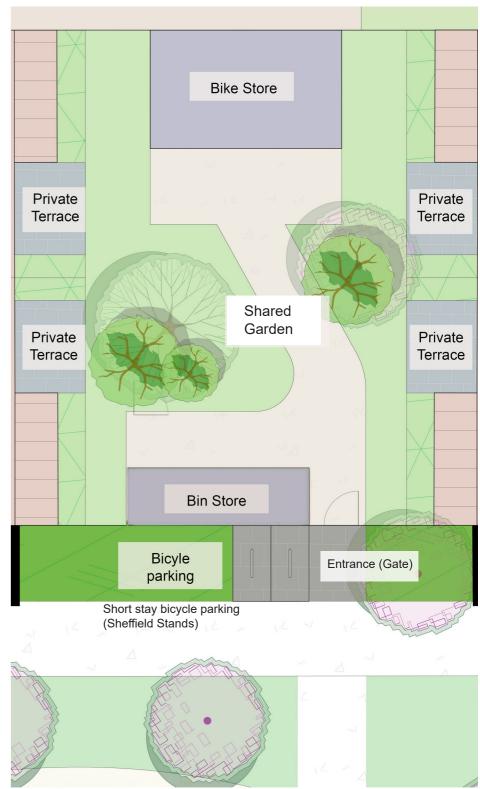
Shared garden layout for duplex blocks incl. secure bicycle storage
